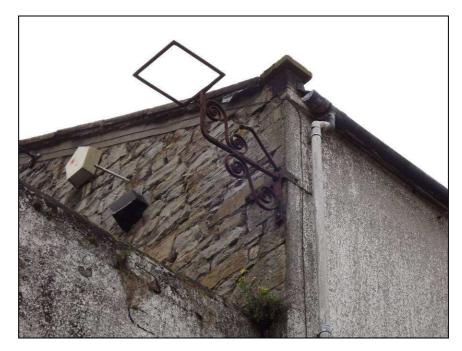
Former wine and spirit warehouse as seen from Ladies' Walk Level of the survey building (Room 4)
